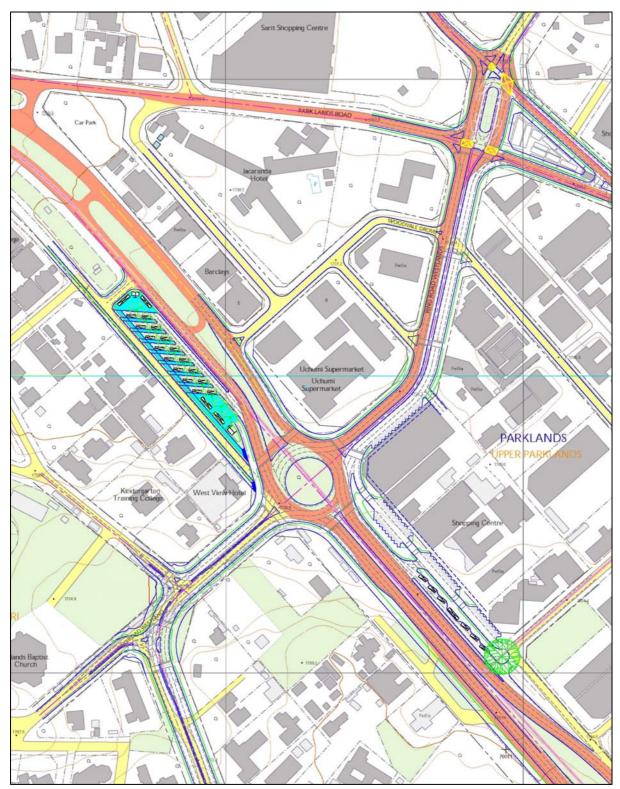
WESTLANDS AREA TRAFFIC CIRCULATION IMPROVEMENT PLAN
